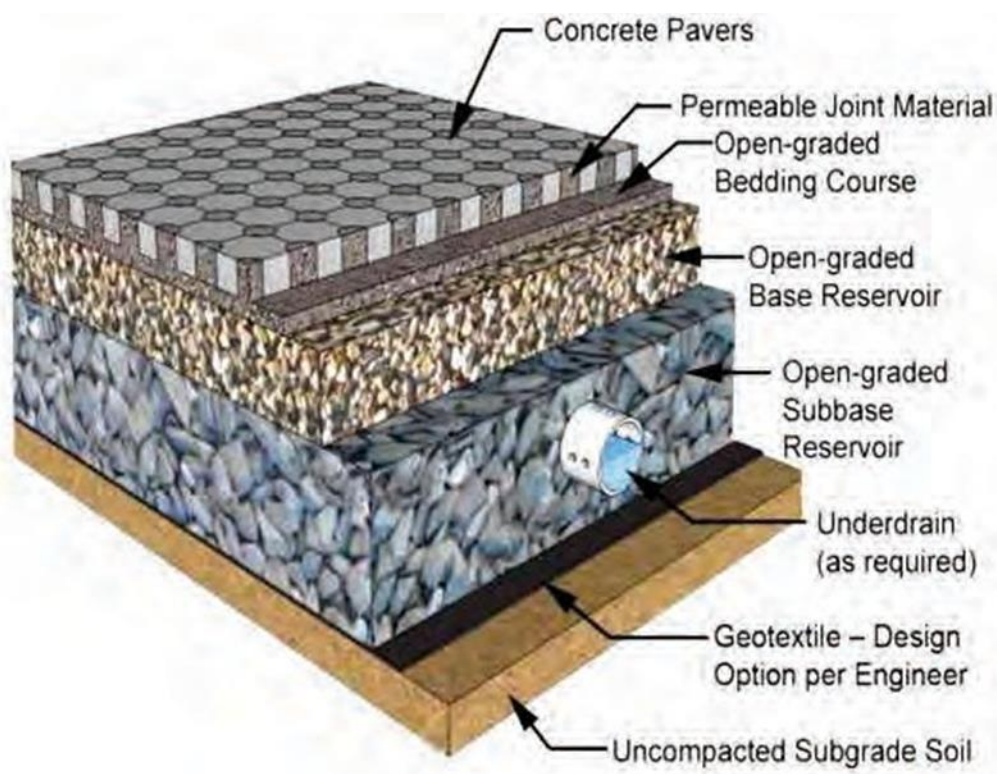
Cross-section of permeable pavement (source: ICPI).
